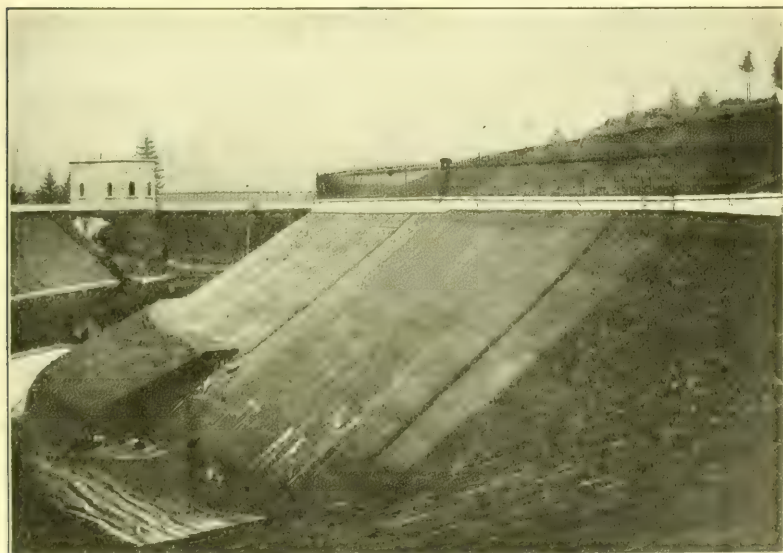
RESERVOIR NO. 2: CRACKS IN BUTTRESS AND IN PARAPET, SEPTEMBER 28TH, 1897.
